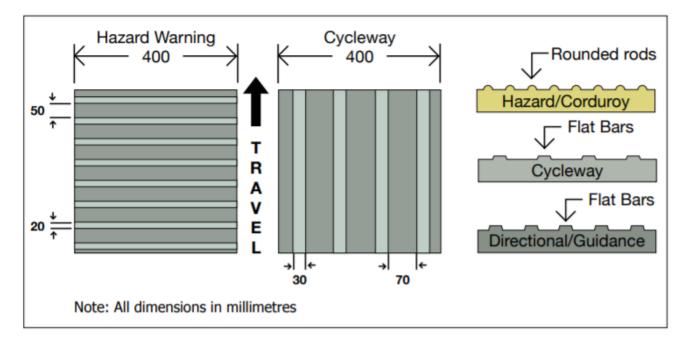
Examples of Hazard Warning and Cycleway Paving (Note: Extracted from NDA Building for Everyone: A Universal Design Approach)
